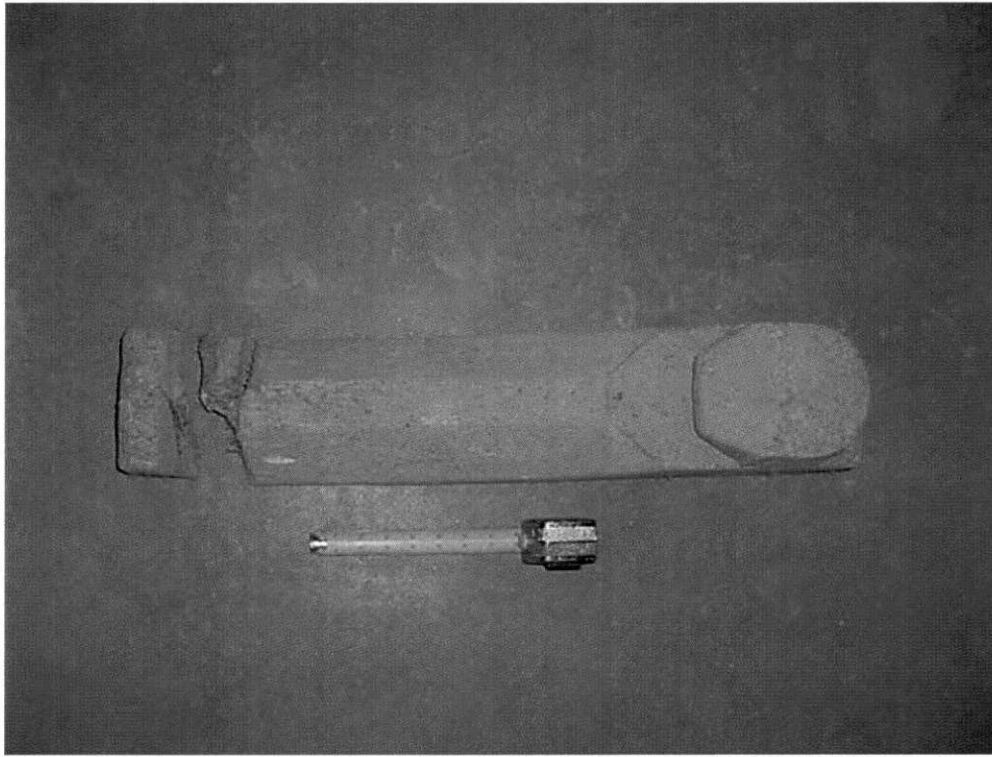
Photograph showing the damaged tail section of the counterfort specimen from Test 4.
